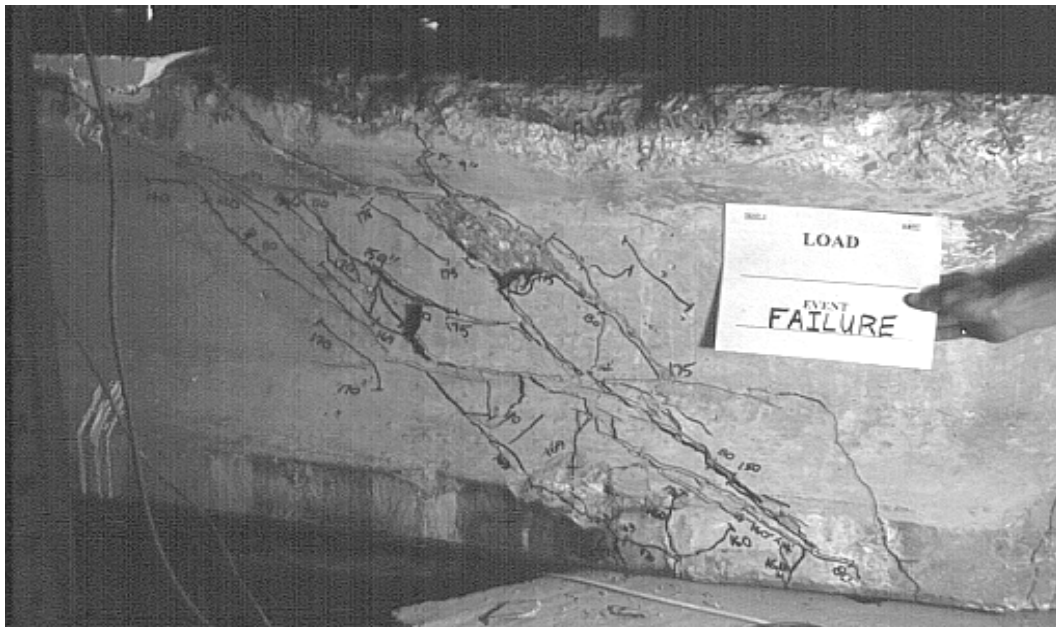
Cracking and Spalling at Failure on West Face of Box Beam 3
